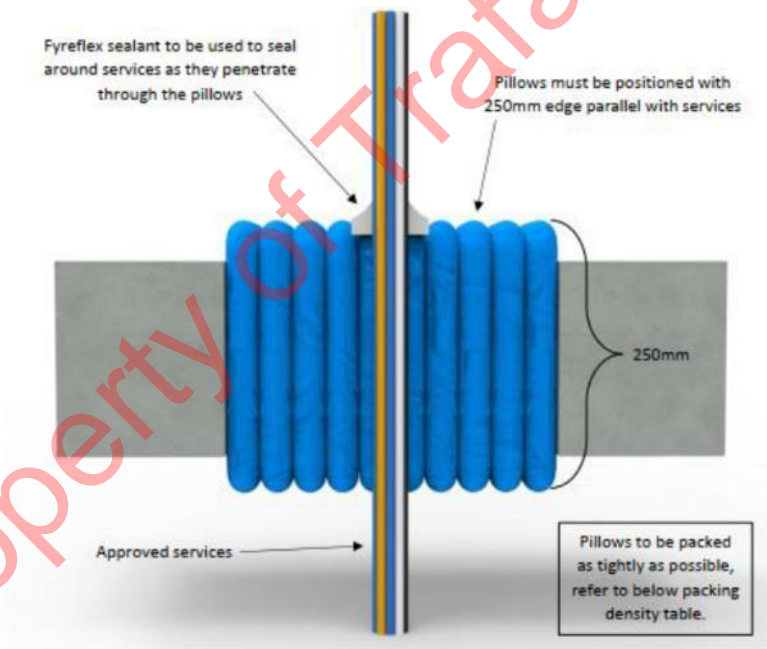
Proposed configuration of Trafalgar FyrePlug pillows in floors
